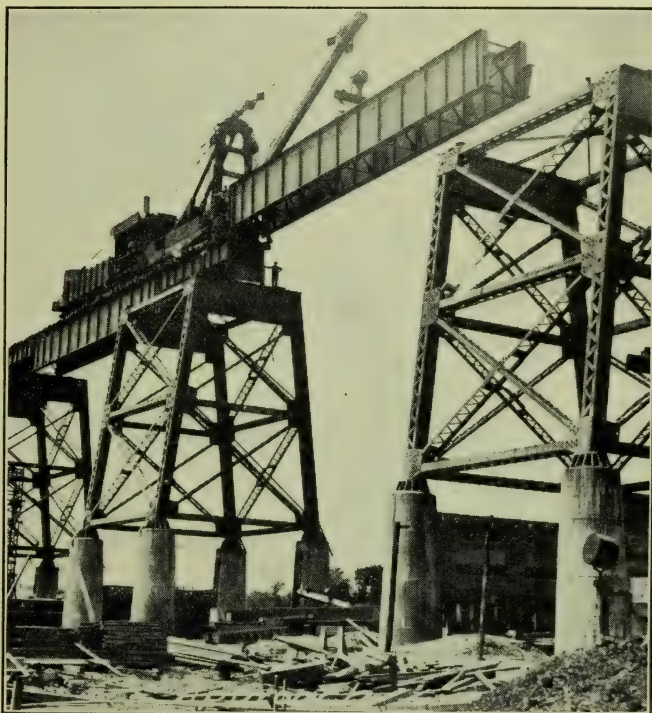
Railway Plate-Girder Viaduct Under Erection
